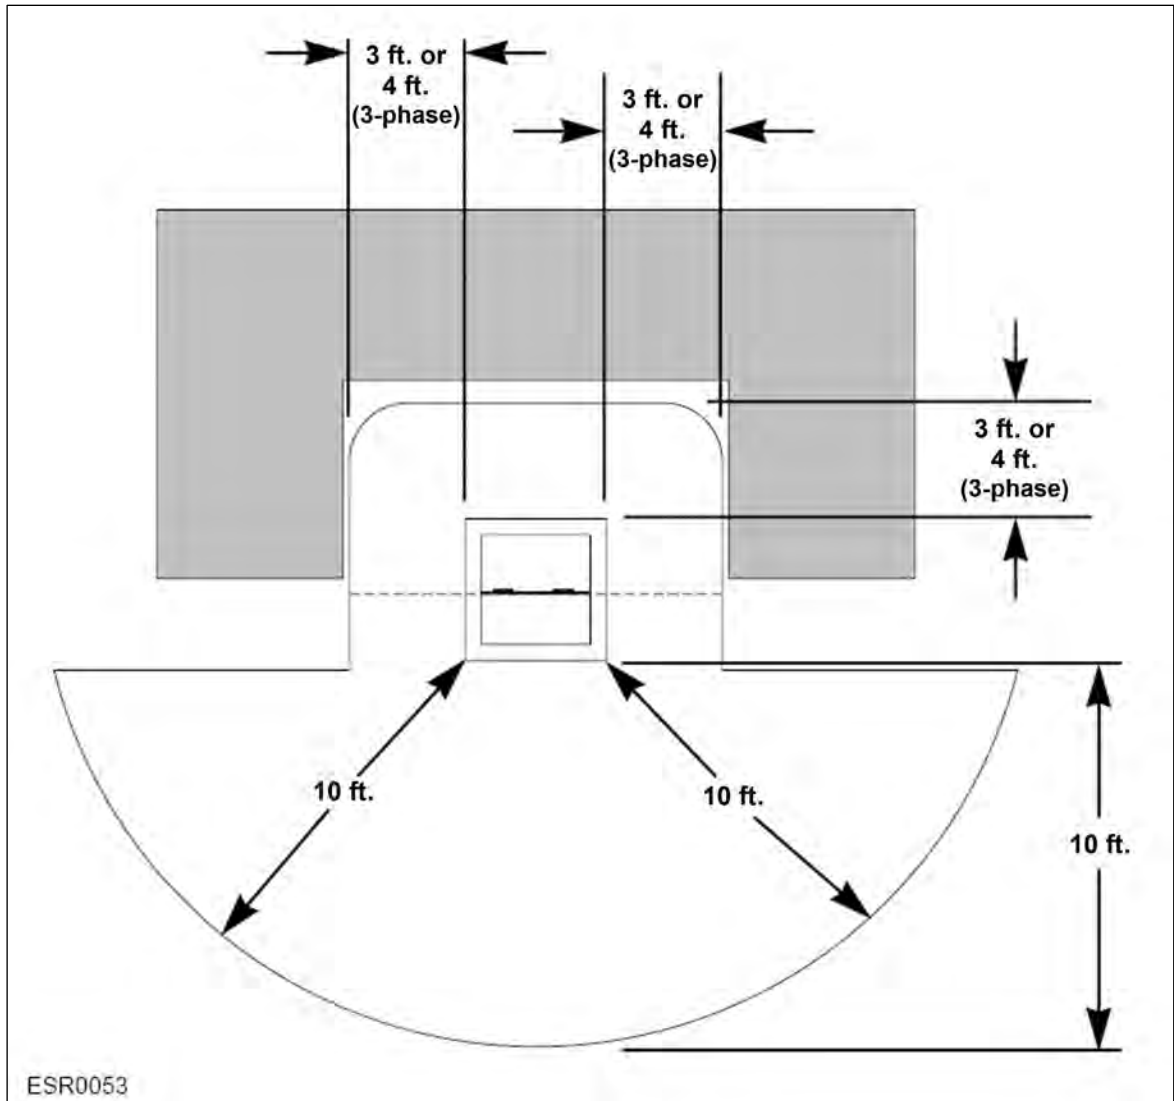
Working Clearances Around Pad-Mounted Electrical Equipment Adjacent to a Noncombustible Structure
